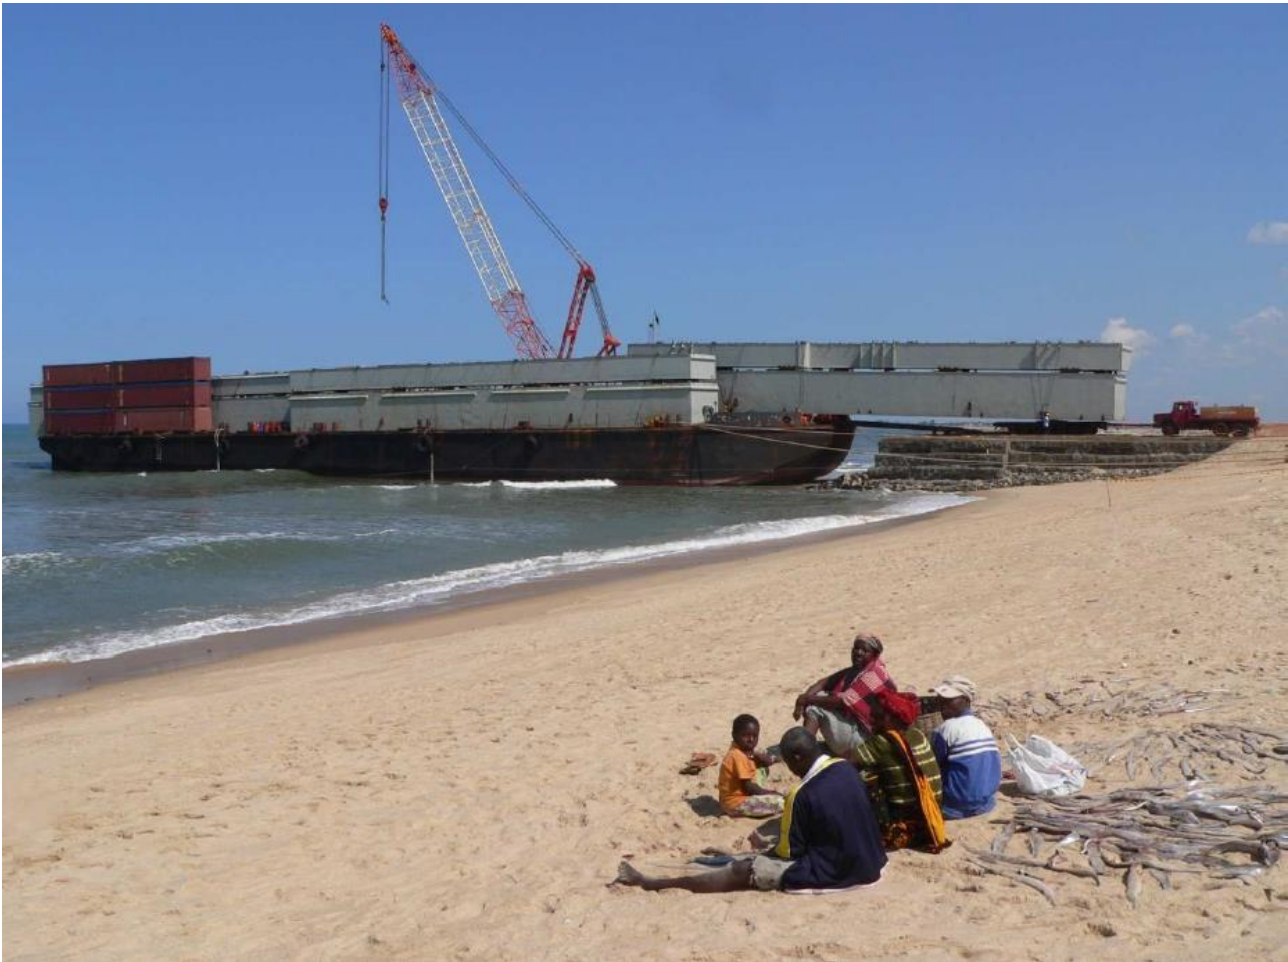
Typical beach landing site with barge offloading heavy equipment (source: Comarco)
